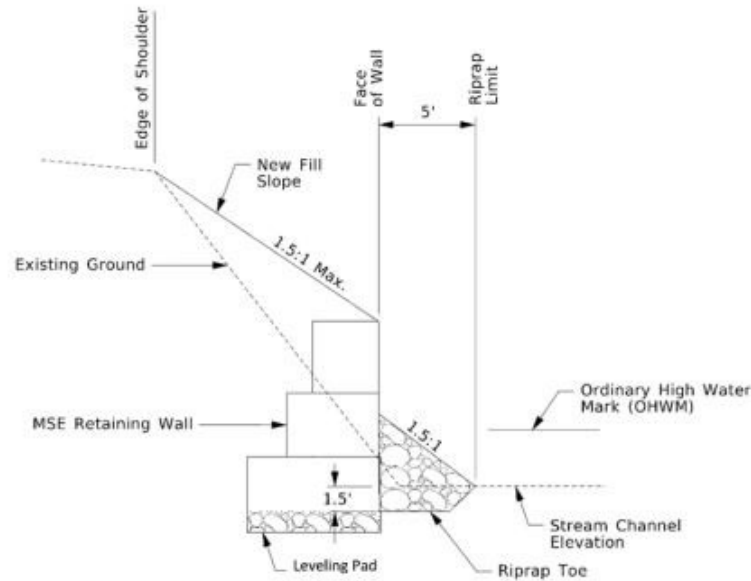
Mechanically Stabilized Earth Embankment – Detail 1.
